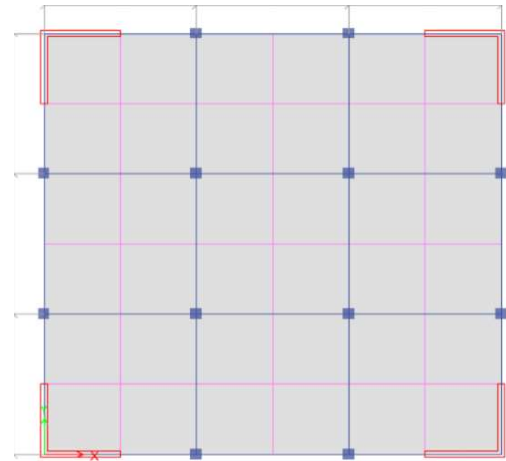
Plan of G+5 storied RCC Building with Shear Wall
